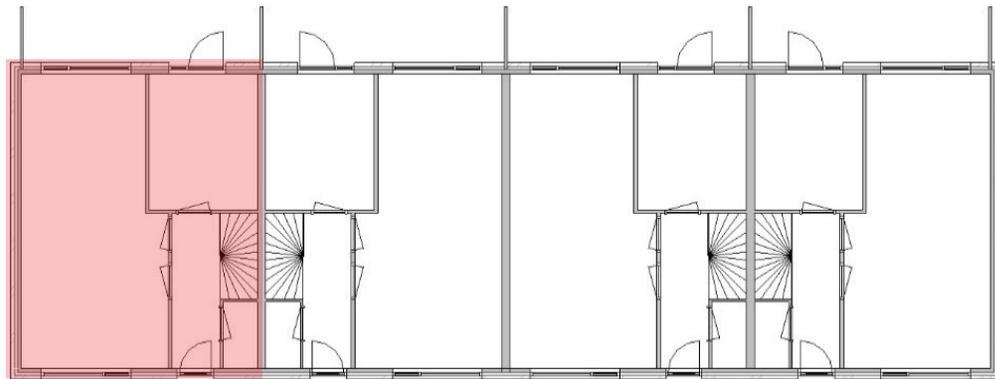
Floorplan of the dwellings (analysed dwelling highlighted in red)
